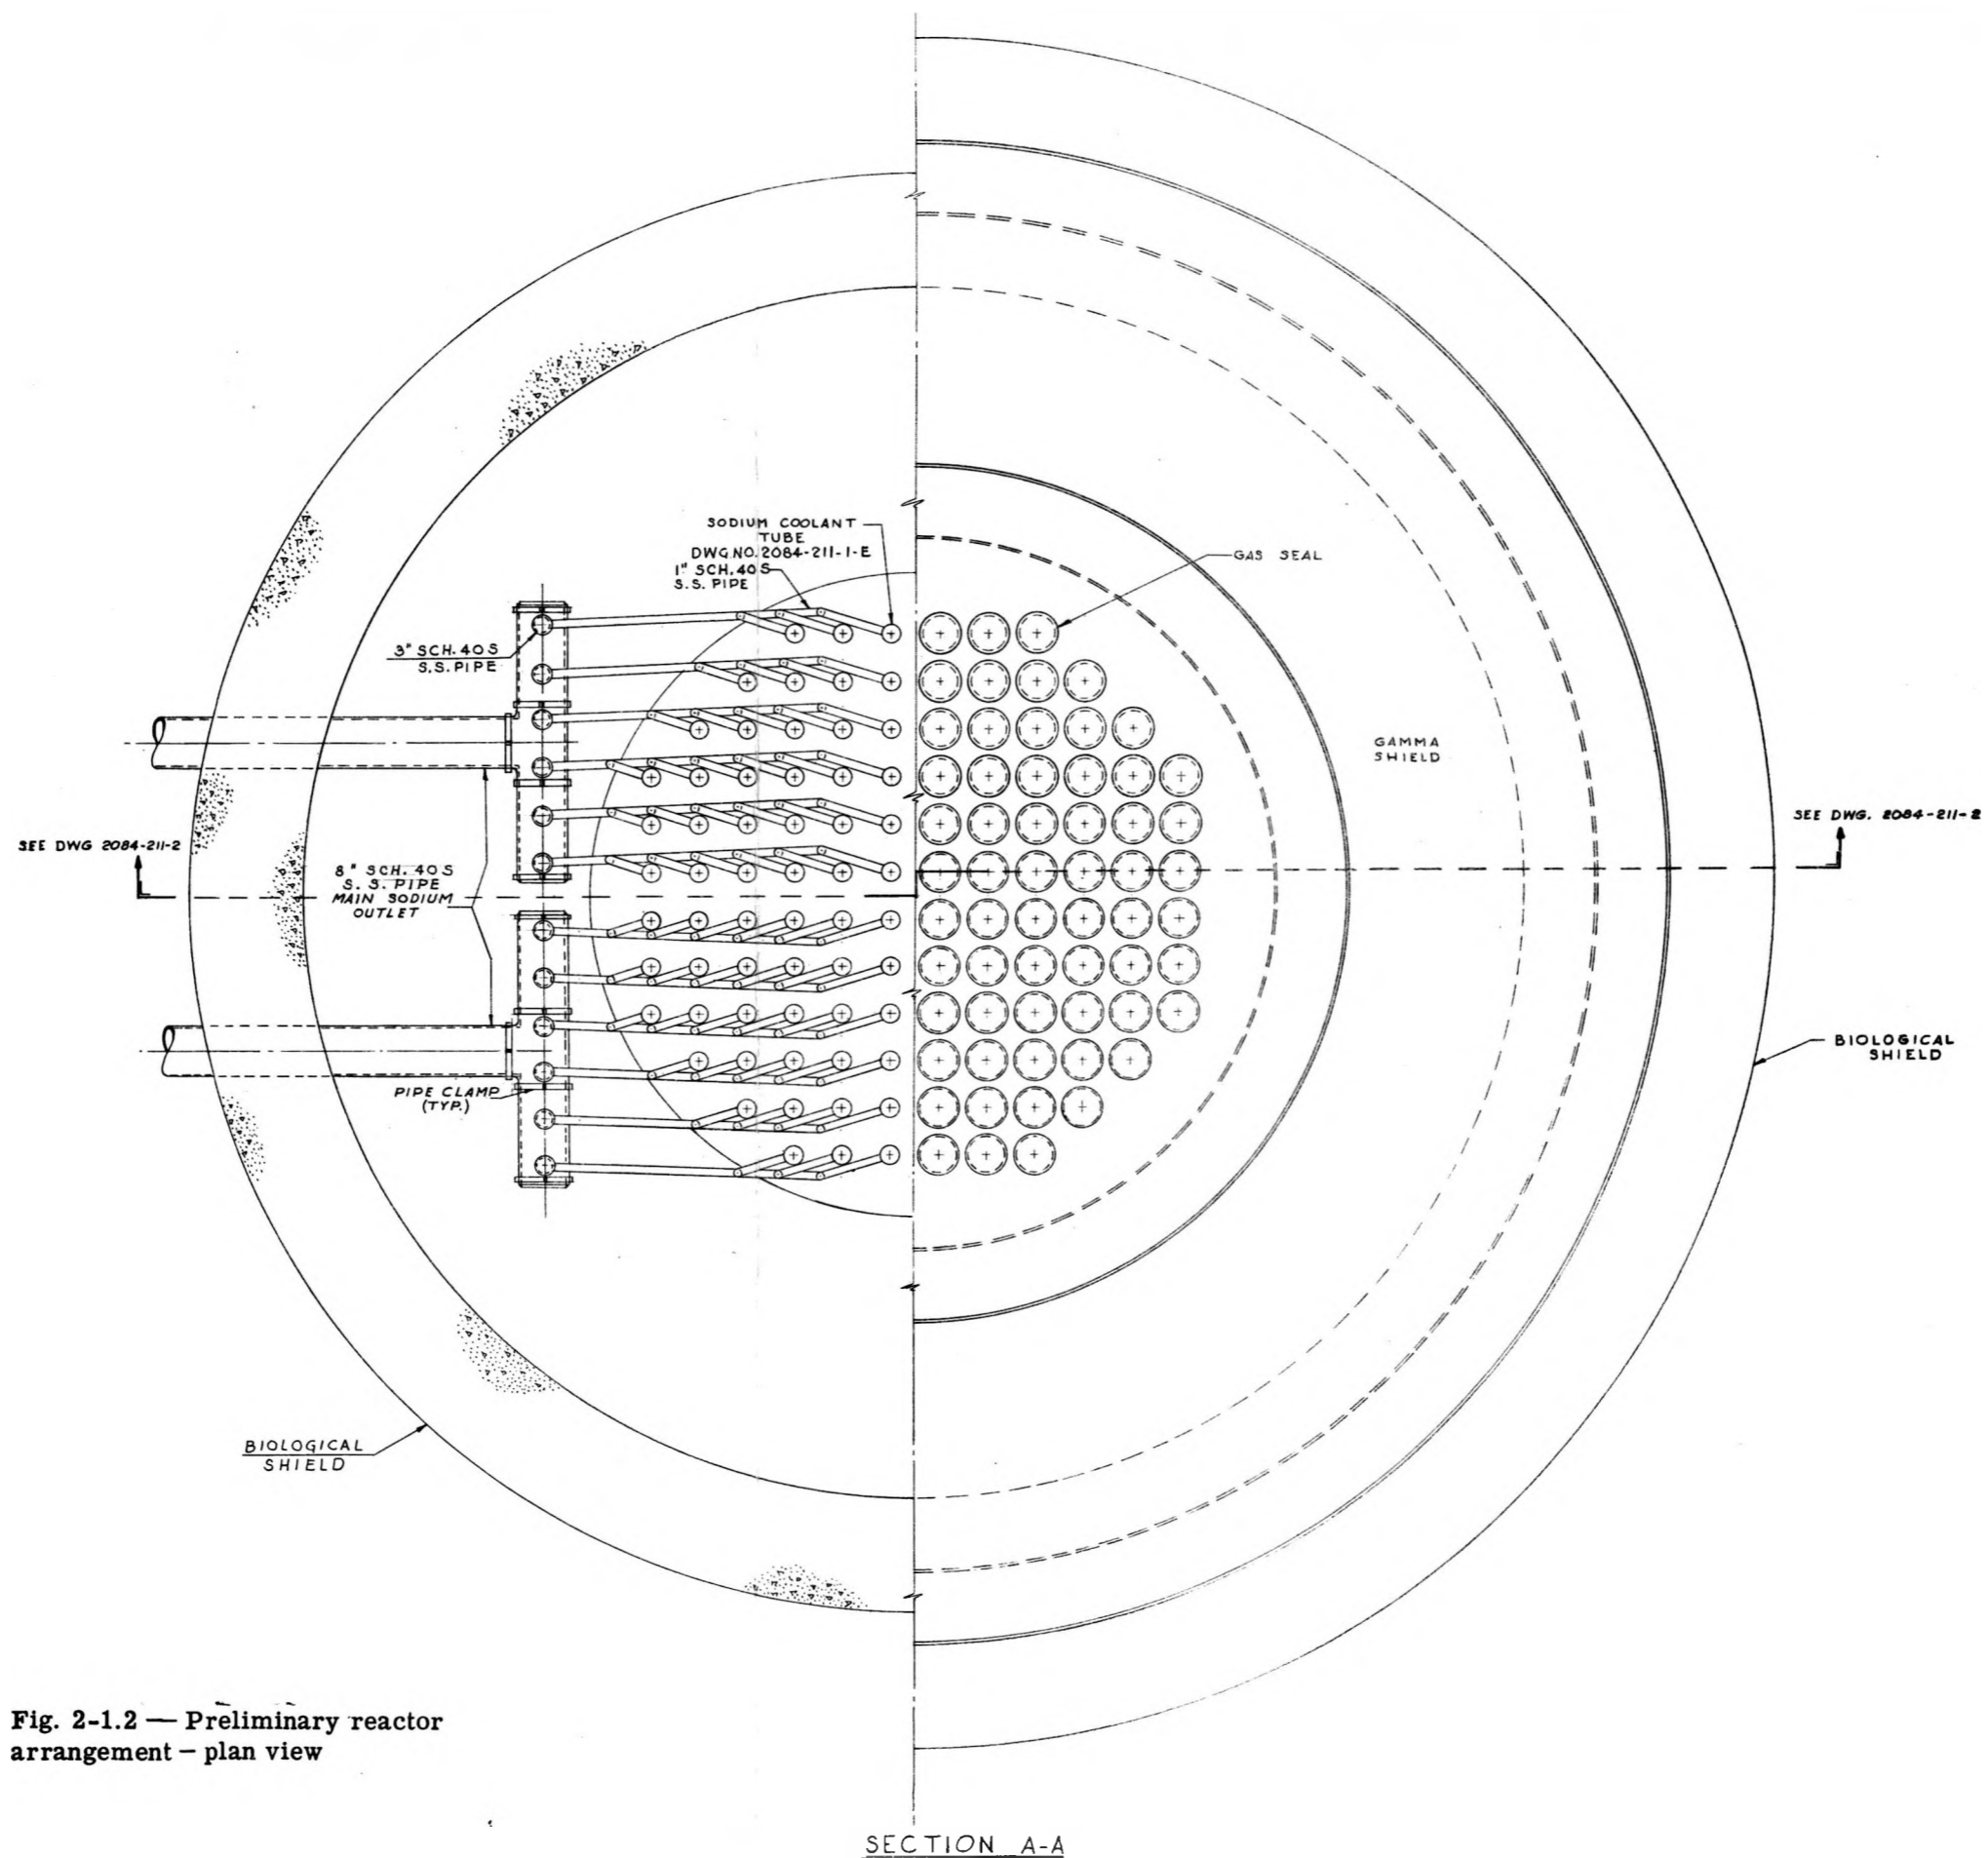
Preliminary reactor arrangement — plan view
